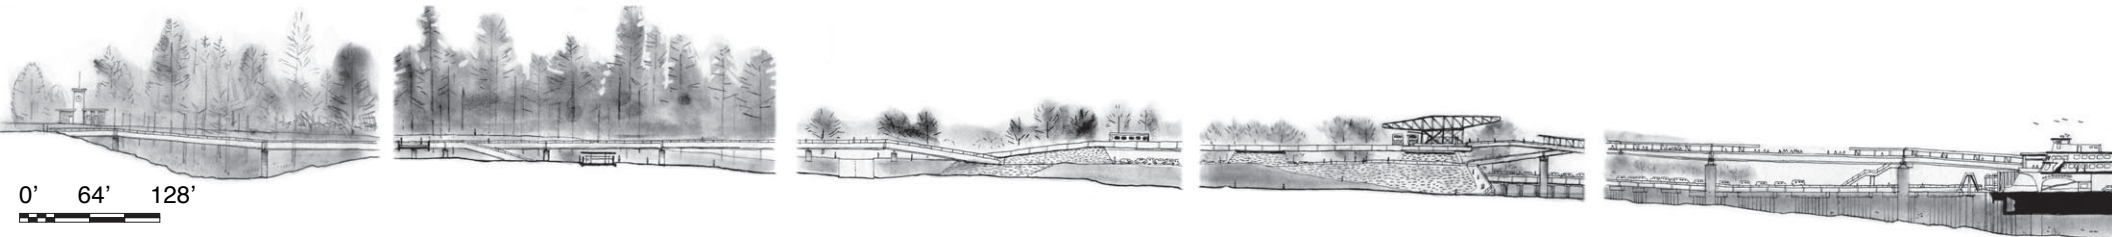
PEDESTRIAN OVERHEAD LOADING RAMP LOOKING SOUTH
